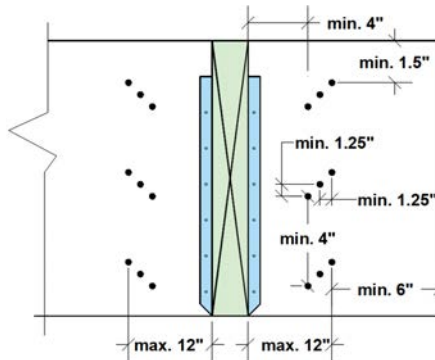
UNIFORM SIDE LOAD DESIGN EXAMPLE
